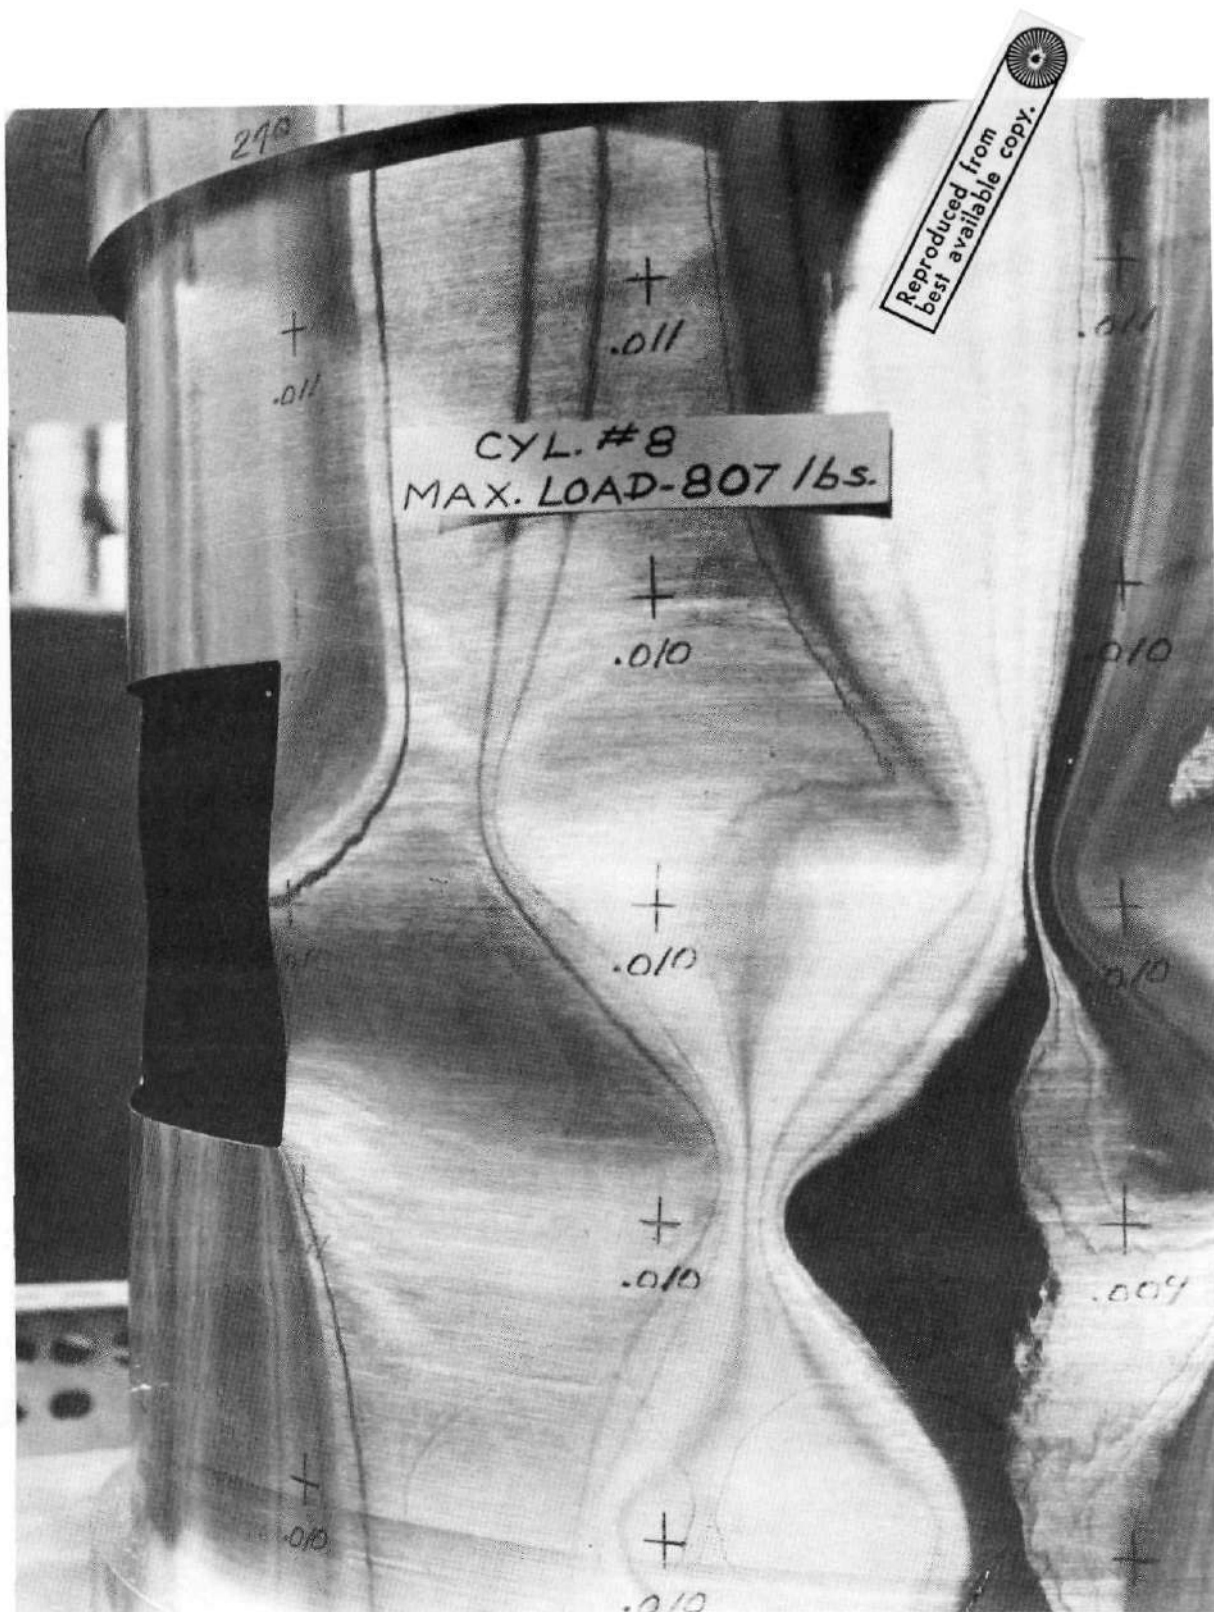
Cylinder #8 After Buckling, Detail View, Cutout Without Gages
